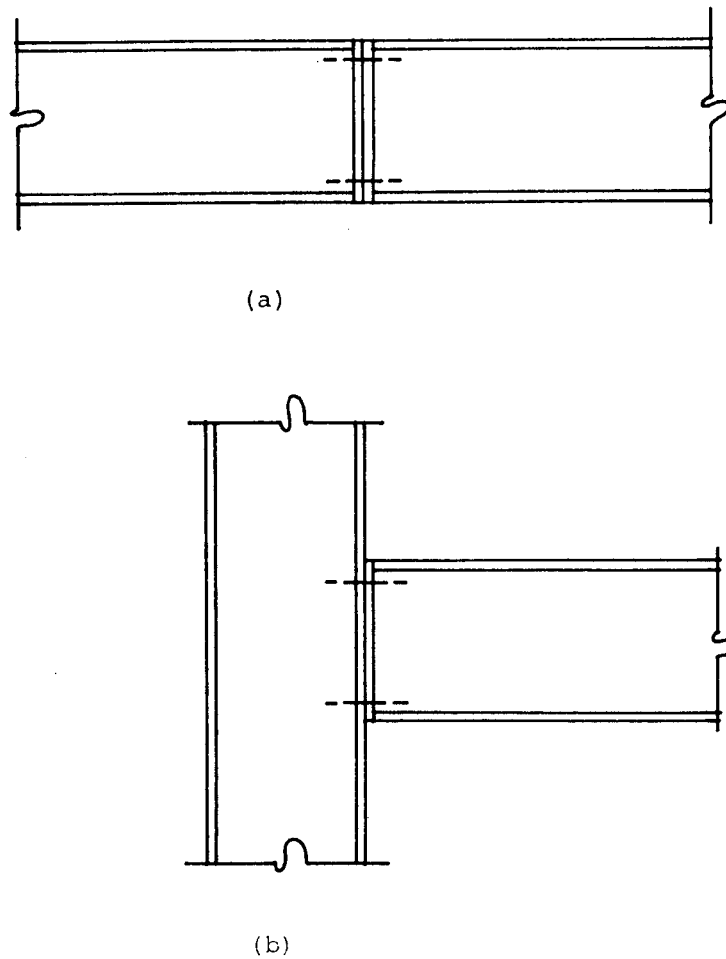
Typical uses of flush end-plate connections. (a) Beam-to-beam connection (splice connection). (b) Beam-to-column connection.
